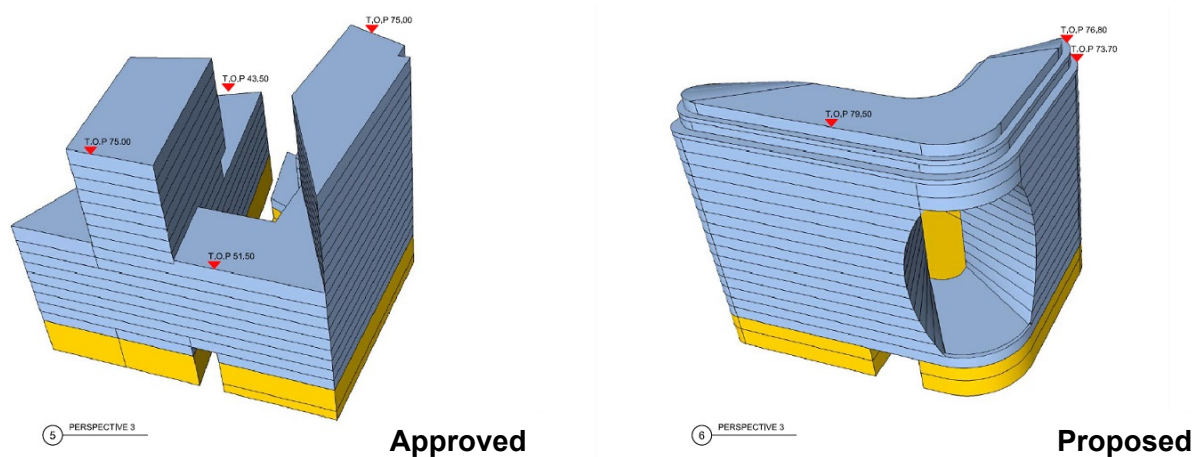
Comparison between building envelopes, as viewed from corner Bourke Street and future Ebsworth Street
